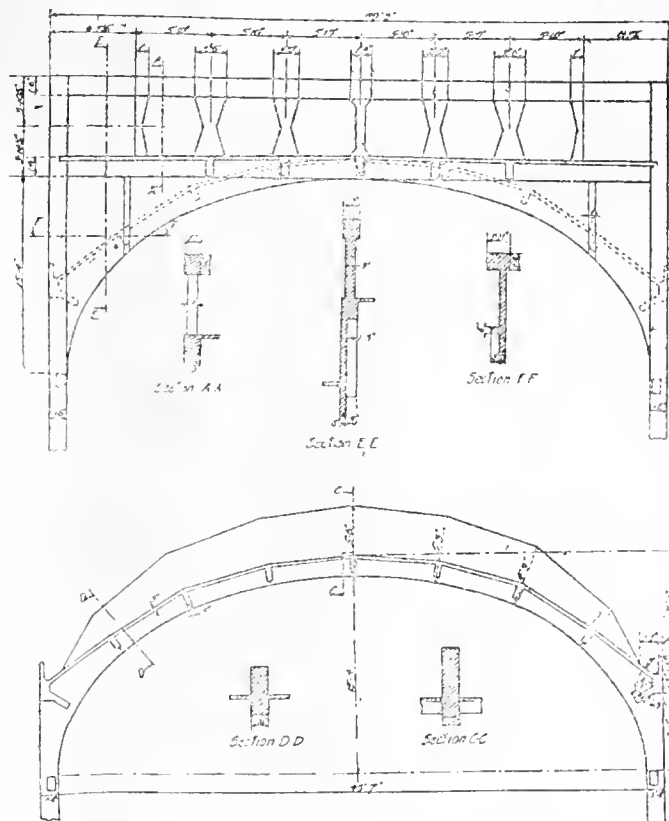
(upper).—"Open" Girder of 46ft. span.
